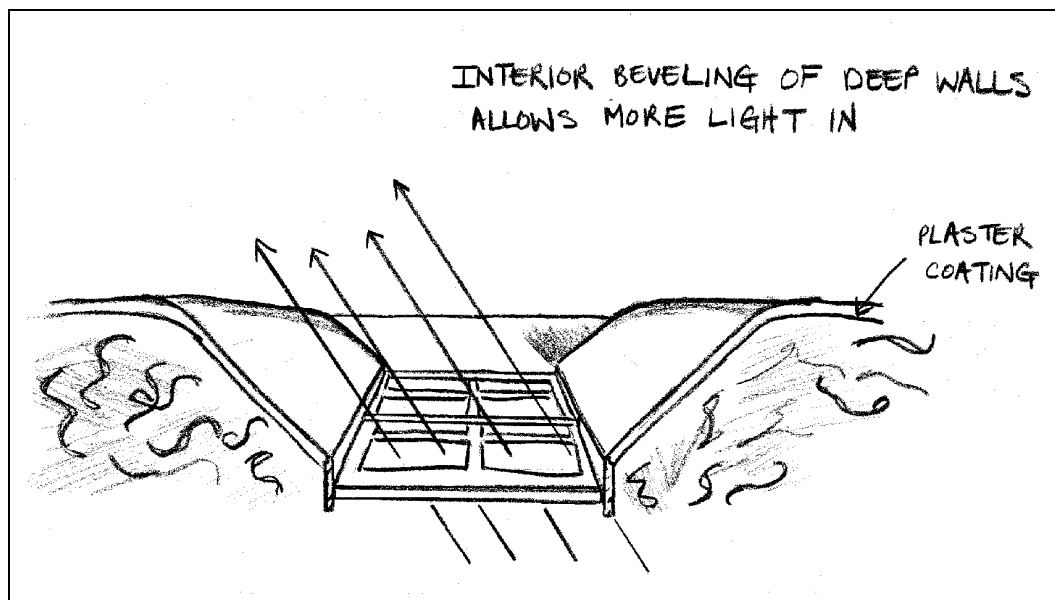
Windows: Sketch illustrating the beveled walls on the interior to allow more light
